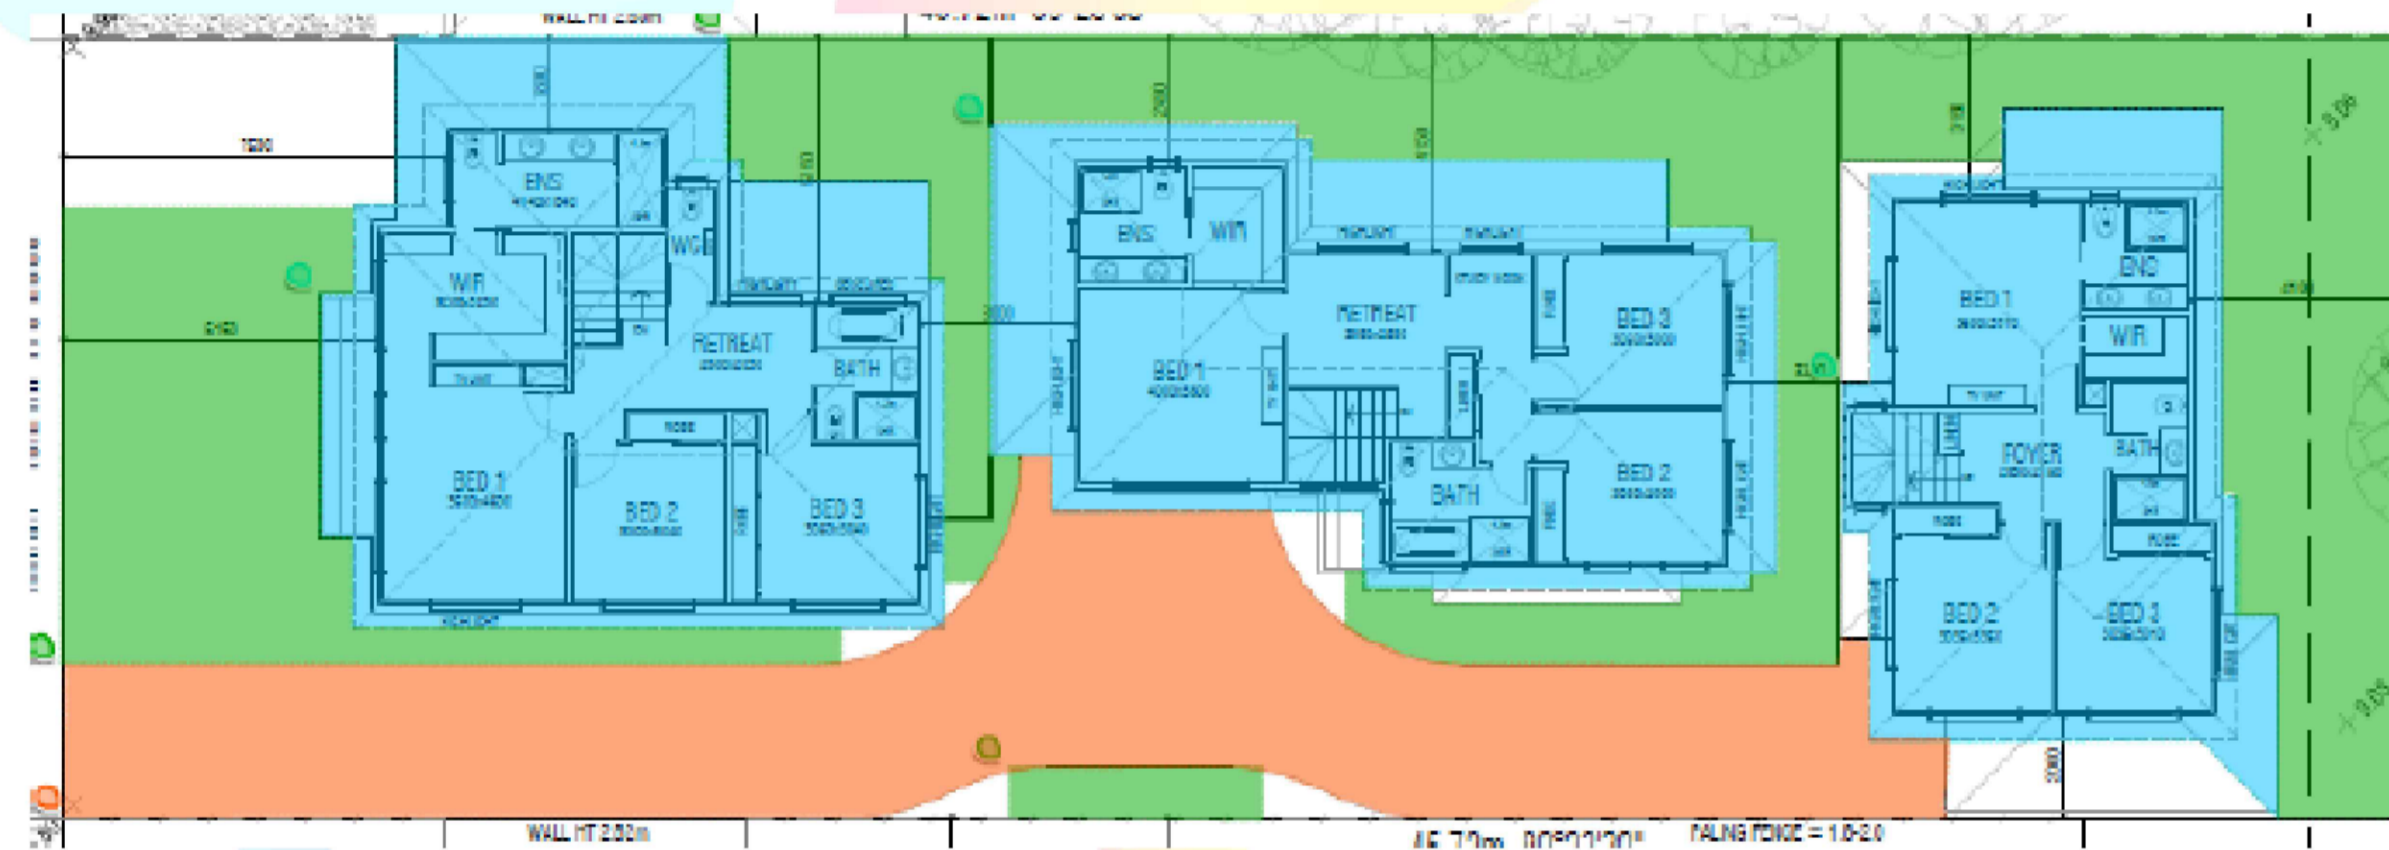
Roof catchment (blue) / Landscaped areas (green) / Area excluded (black) / Untreated areas (white) / Potential driveway area in which a part (30sqm) will be permeable (orange)
